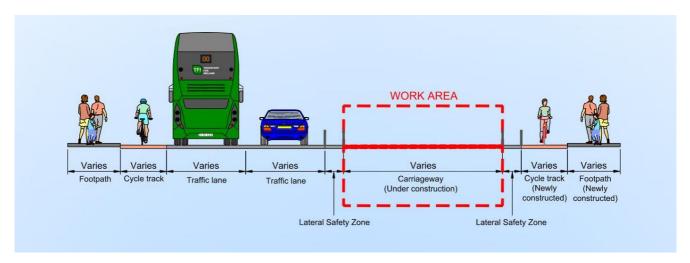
Traffic Management Cross Section, Section 2 - Stage 3
